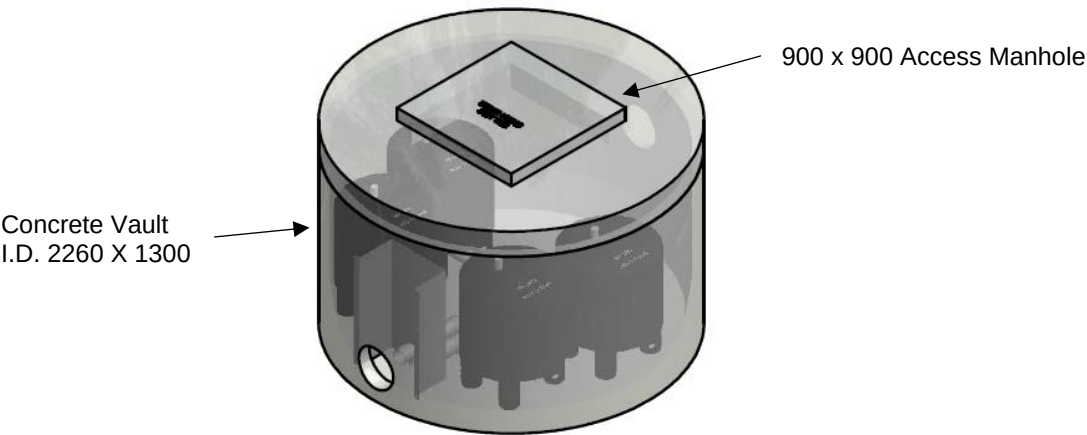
Concept Cartridge Vault Configuration and Internal Dimensions (I.D.)
